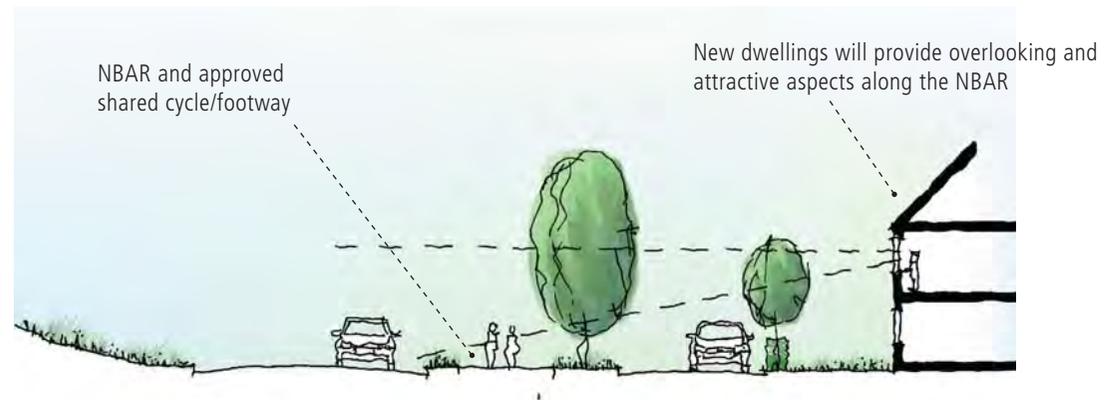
Illustrative section showing potential relationship of new housing with the North Bexhill Access Road.
